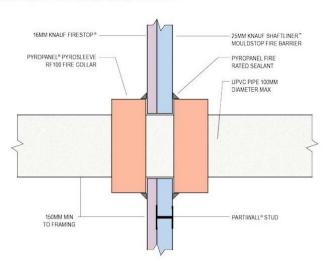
uPVC Pipe Penetration at Roof Space - FRL -/60/60
